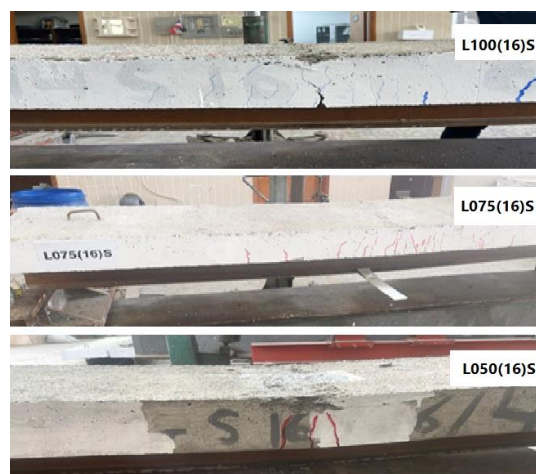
Failure modes and crack patterns for steel-LWSCC beam specimens under sagging bending moment
